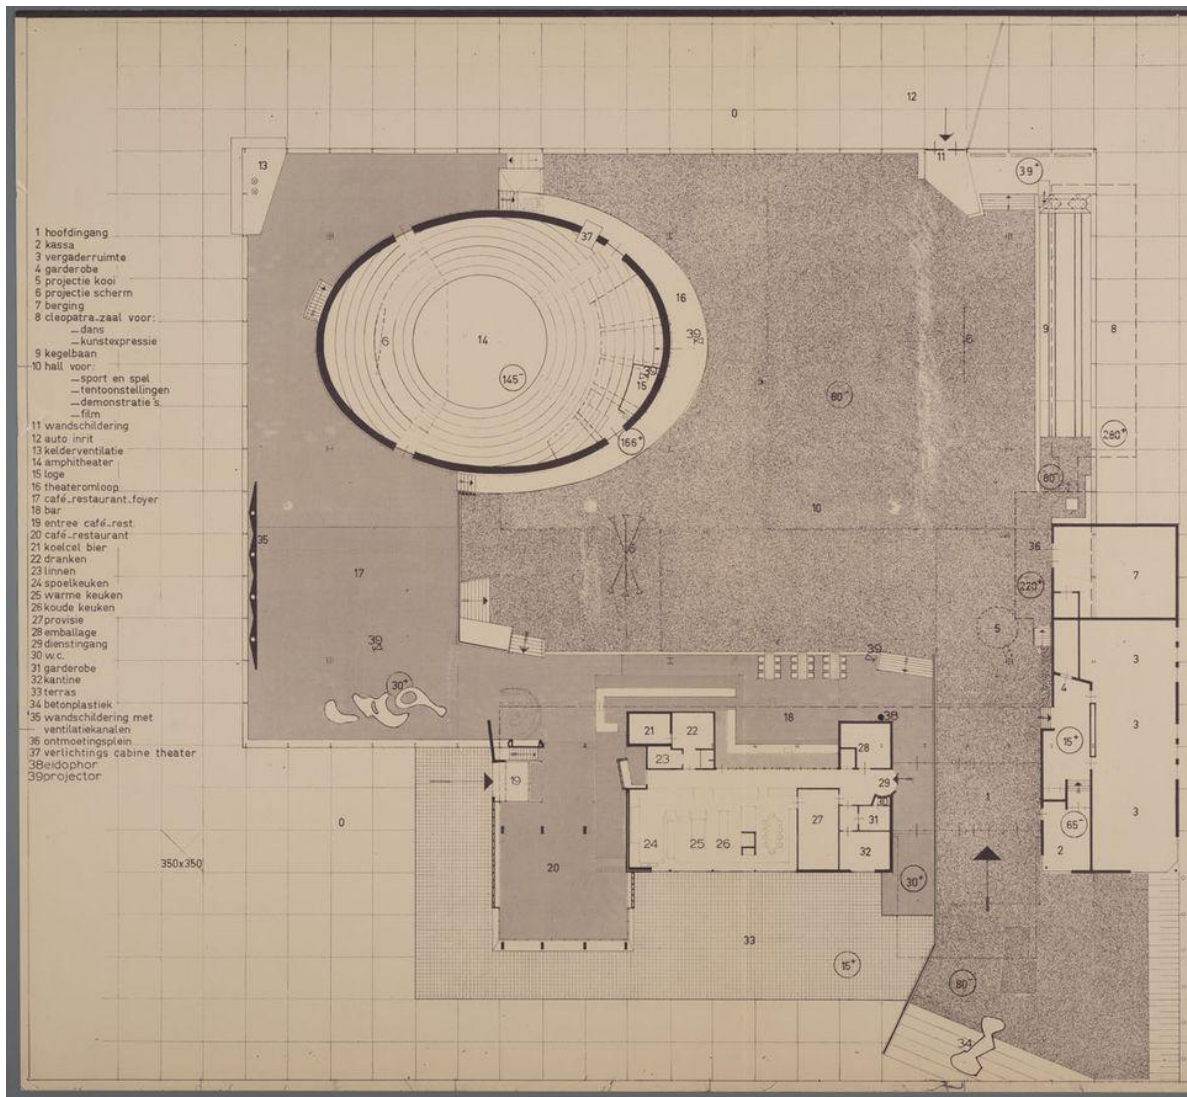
, Ground floor plan of the Meerpaal in Dronten (NI archive, 1967)
